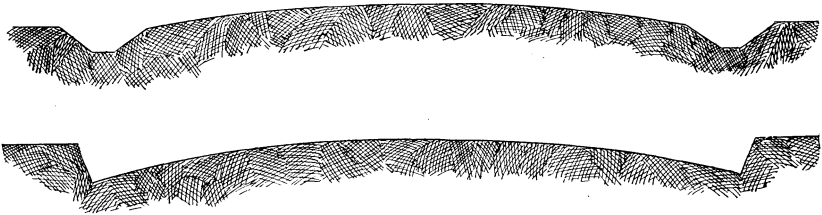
Cross sections of two good forms for earth roads. The lower section can be made with a road machine and both sections can be rolled and constructed so that water will run off easily and quickly.
